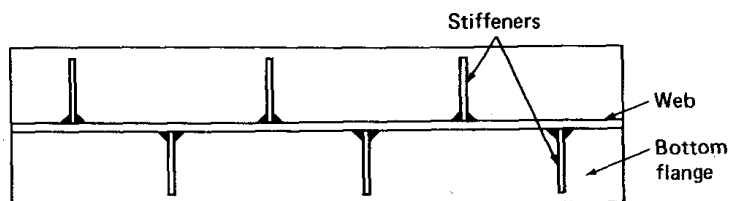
Horizontal section of a plate girder with alternated stiffeners
